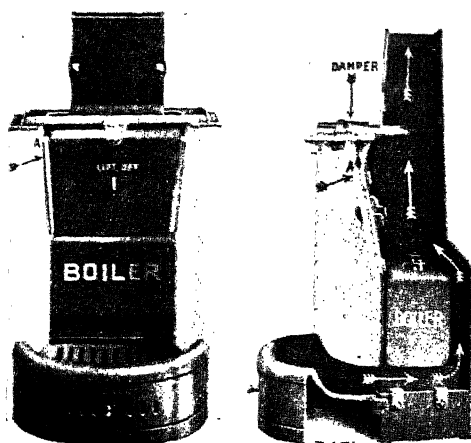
GRATE WITH BOILER, COMPRISING SELF-CONTAINED IRON BOILER FLUE WITH SIDE BRICKS, LIFT-OFF BACK PLATE AND PULL-OUT DAMPER, WROUGHT WELDED BOILER, STOOL BOTTOM GRATE AND BERLIN BLACKED FRET WITH DRAUGHT REGULATOR. SUITABLE FOR FITTING AT BACK OF ANY TILE SURROUND WITH 16 IN. FIRE. (Clark, Hunt & Co., Ltd.)
